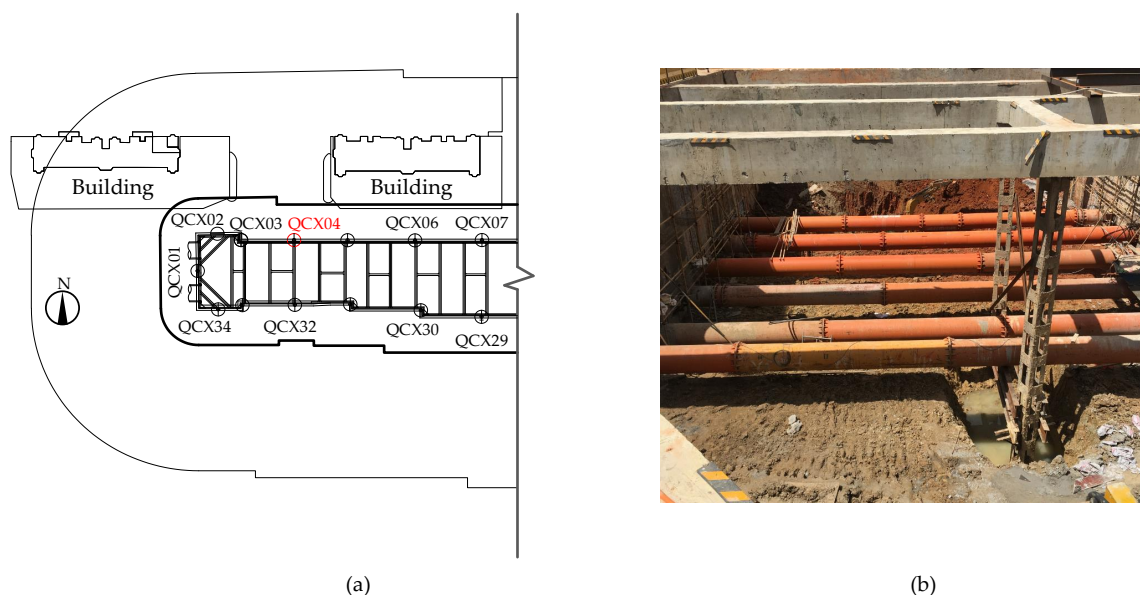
Foundation pit excavation of a subway station. (a) Layout. (b) In-situ photo.
